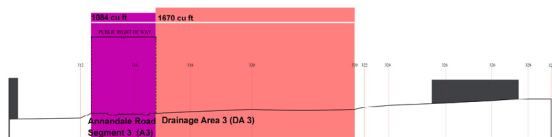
Stormwater Catchment for Road Segment A3. (Source: Author.)
